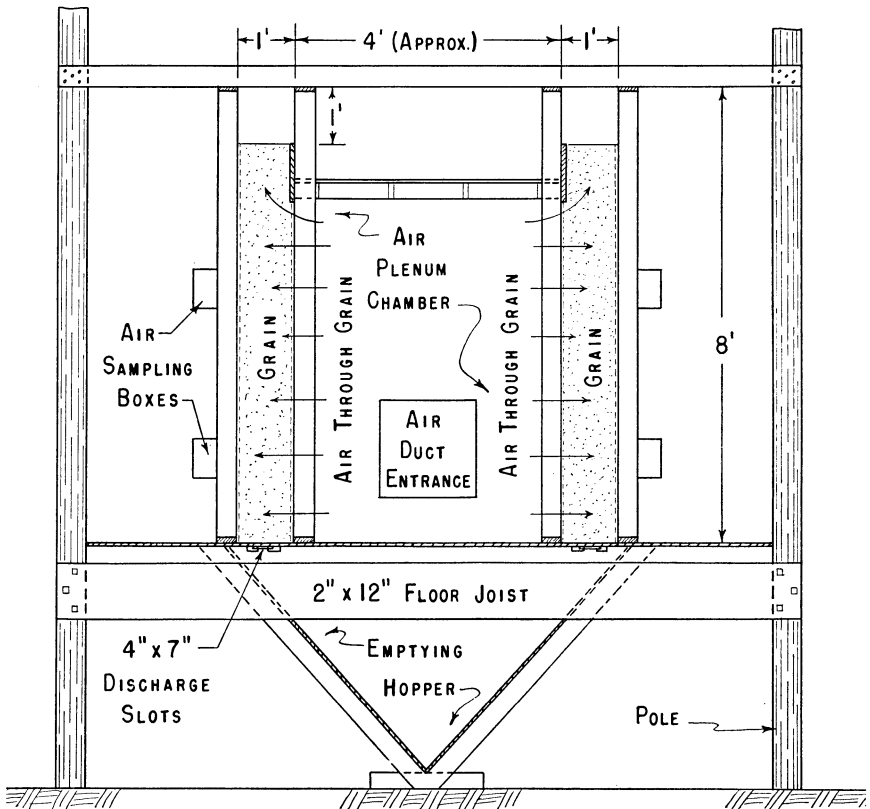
This cross section drawing shows the general arrangement of column type drying bins erected on the Oklahoma Experiment Station's Agronomy Farm west of Stillwater.
